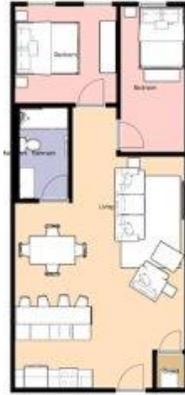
Two Bedroom and One Bathroom Unit in Buildings 623 and 625
